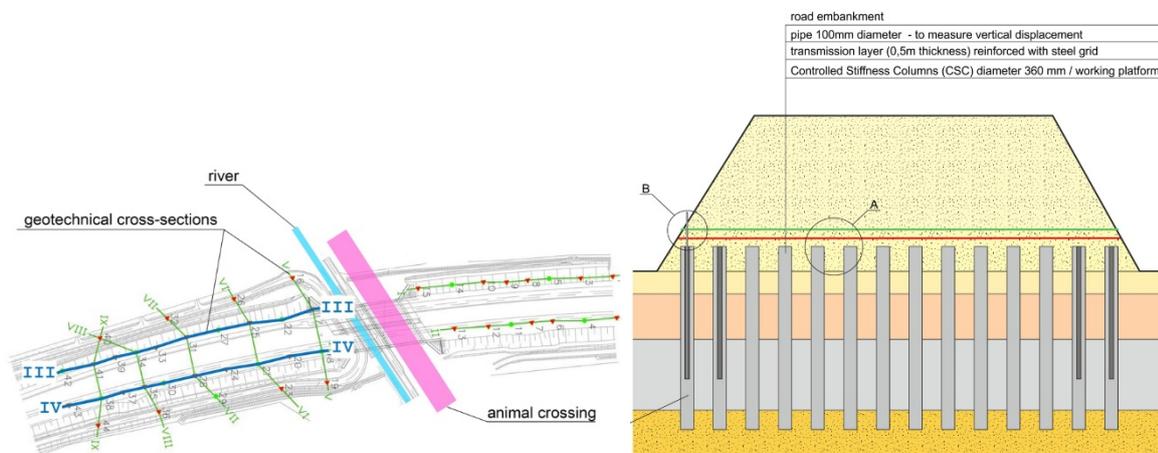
The road embankment. SHM plan view (left), embankment cross section (right).
